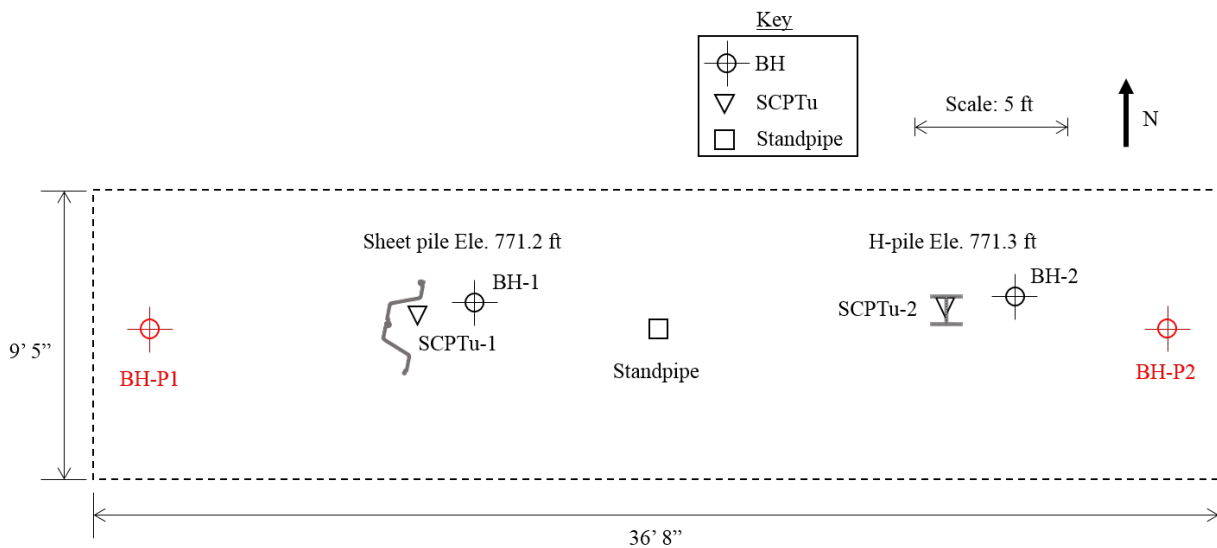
Pile load test layout and locations of select in-situ tests performed before test pile installation.
